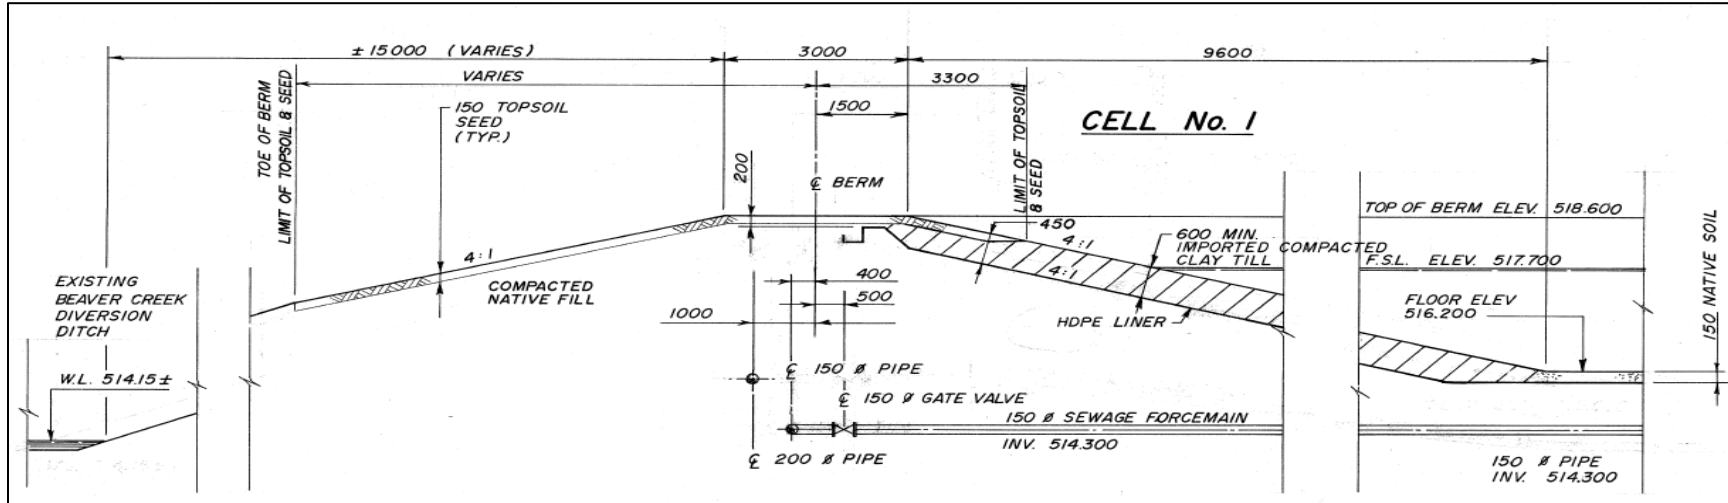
1988 Construction drawing - Western berm cross section at cell #1 (Modified from Bullée Consulting Ltd. 1988b)
